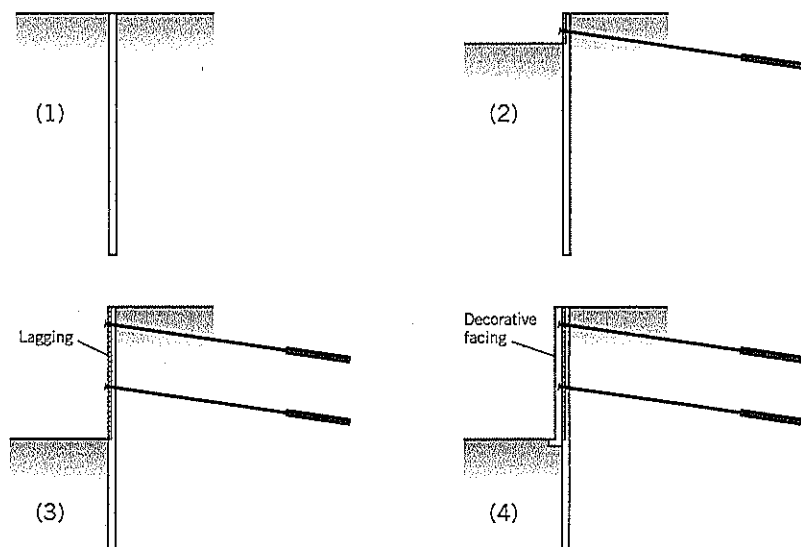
Construction sequence for a soldier pile retaining wall (see text).
